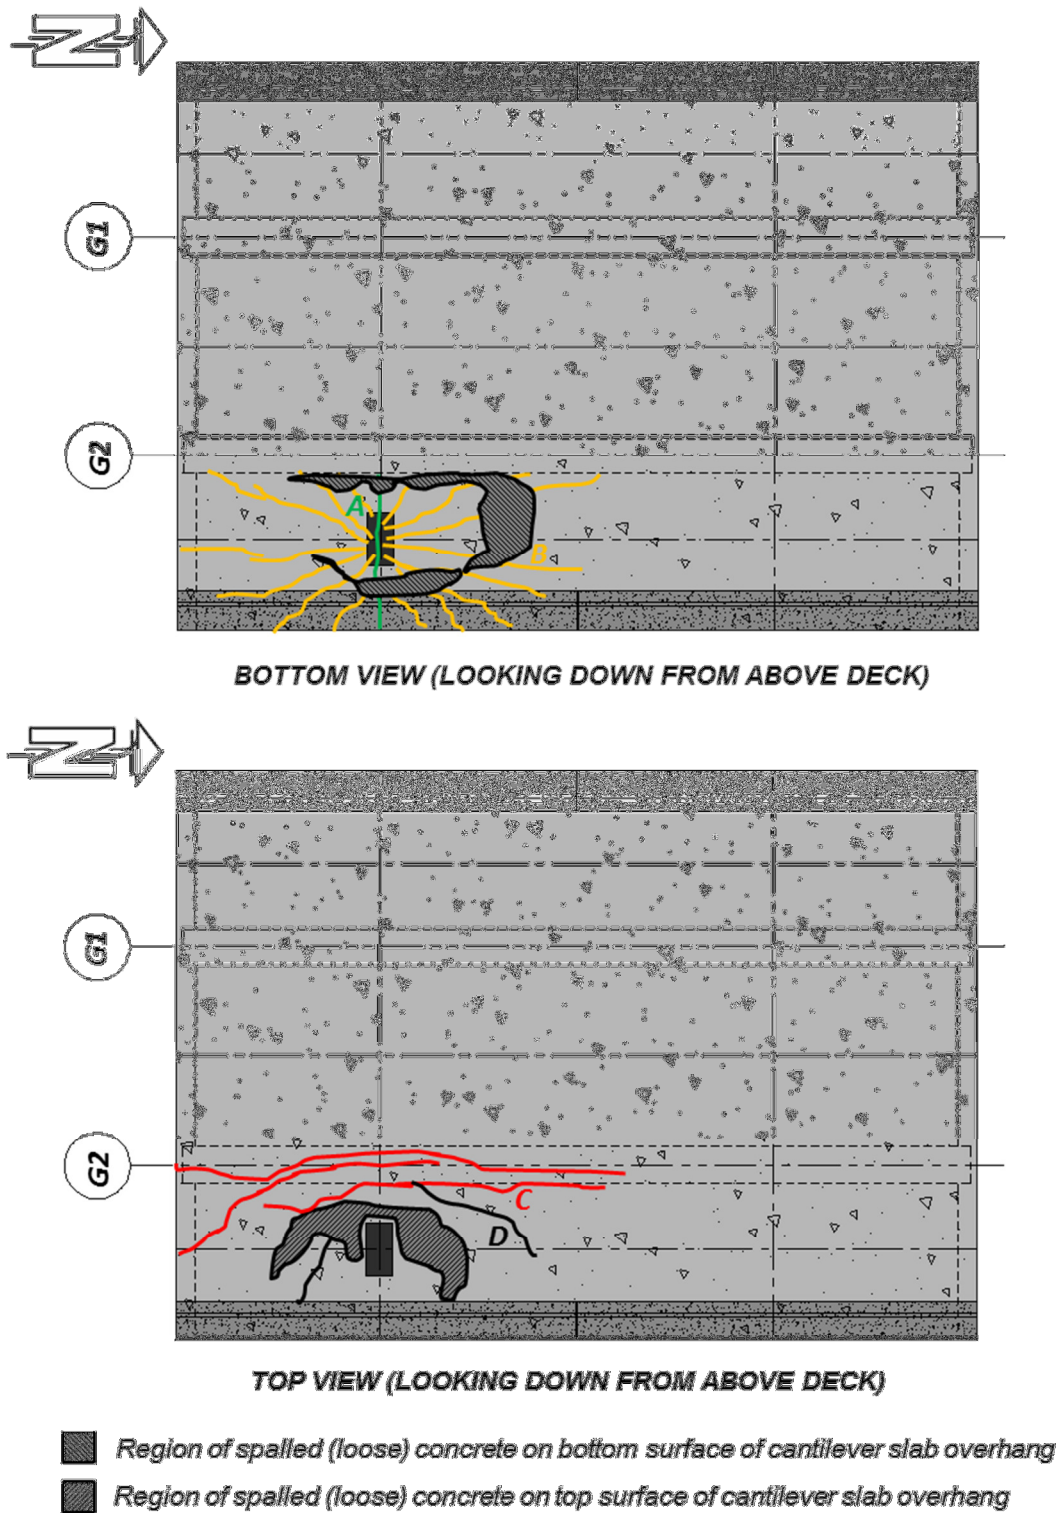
Crack patterns for the cantilever section with steel reinforcement subjected to fatigue cyclic loading
